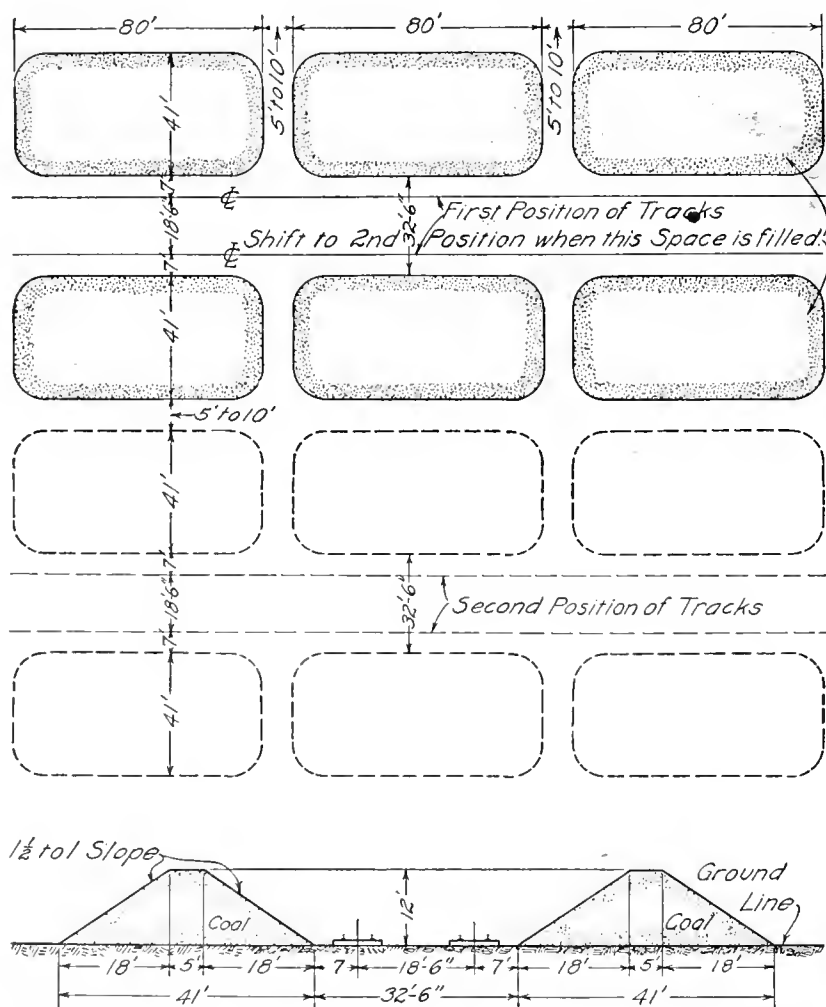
Plan and Section Illustrating Coal Storage System of Missouri Pacific Railroad.
